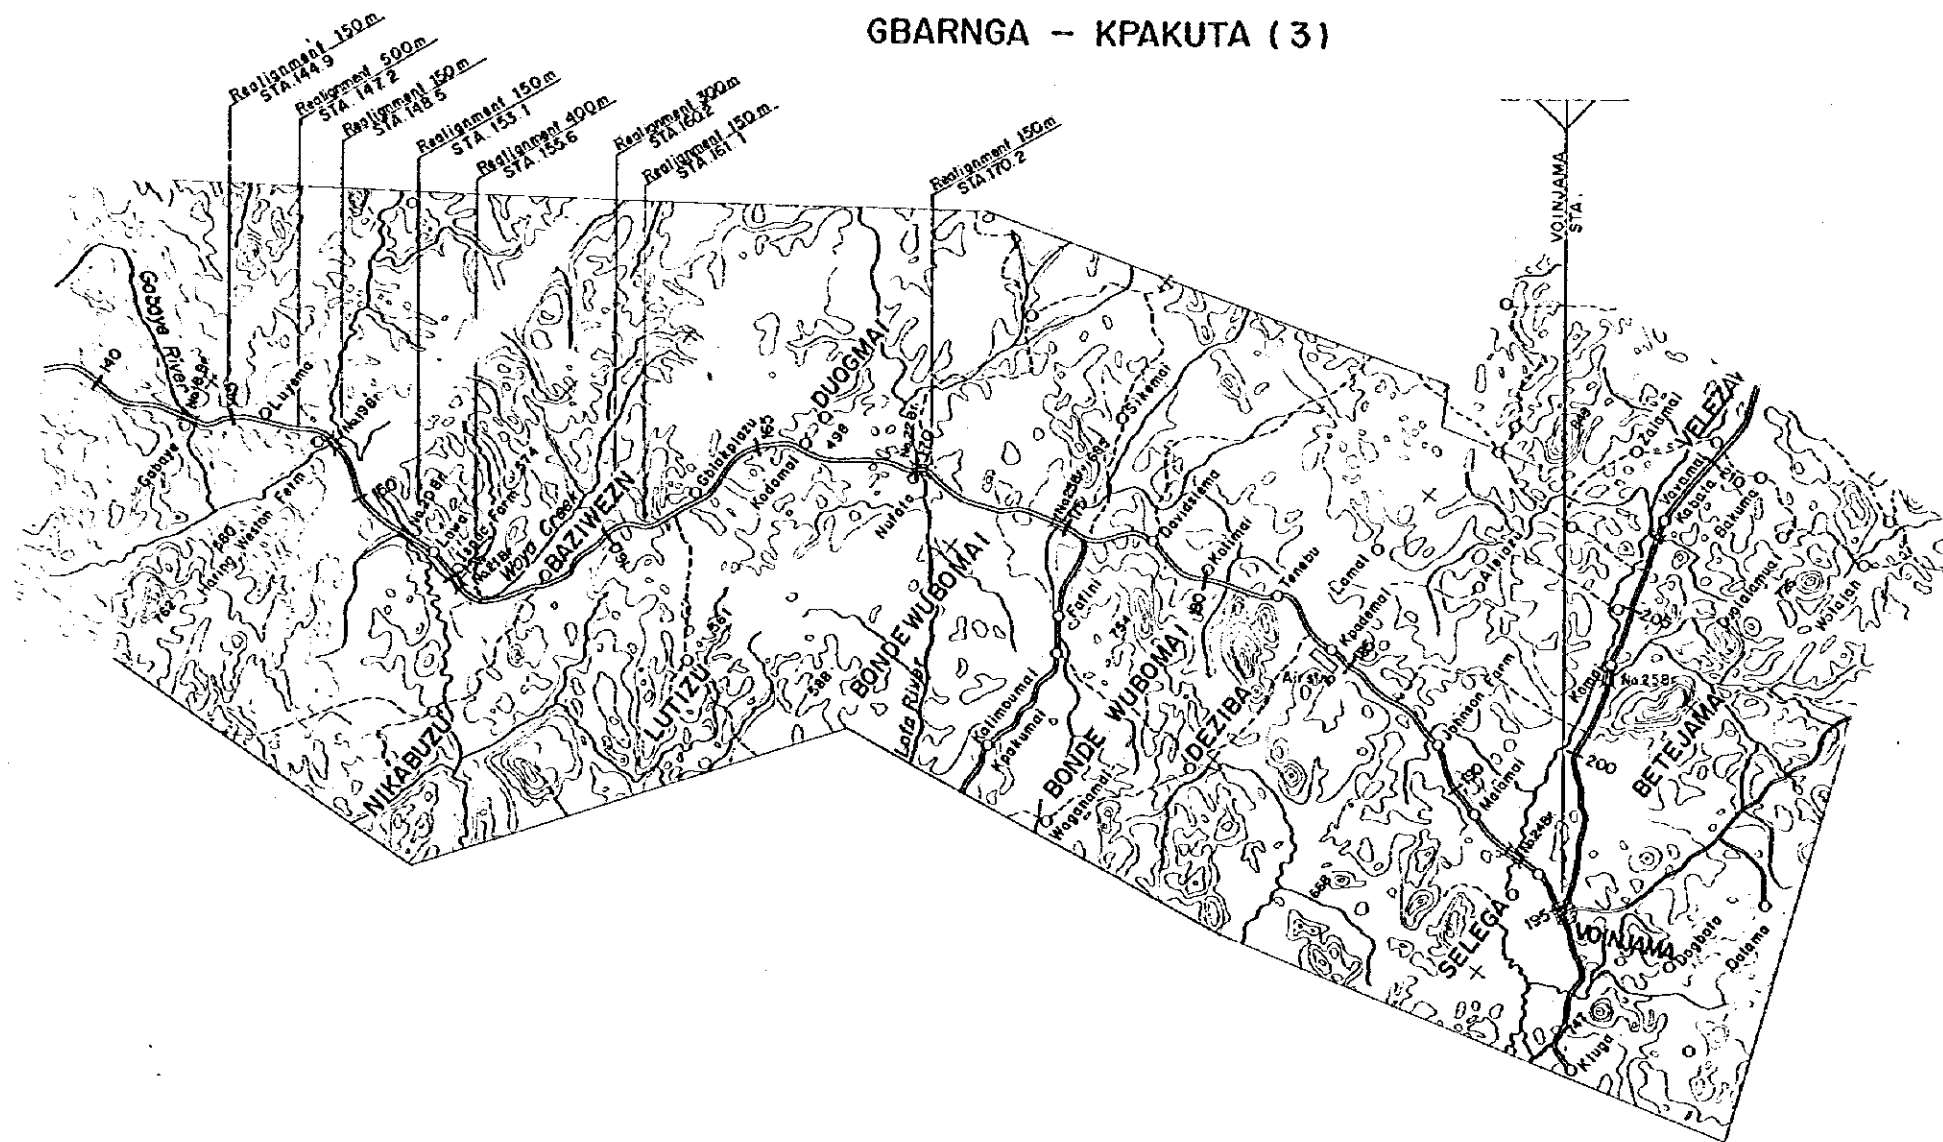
(3) ROAD PLAN AND PROFILE
